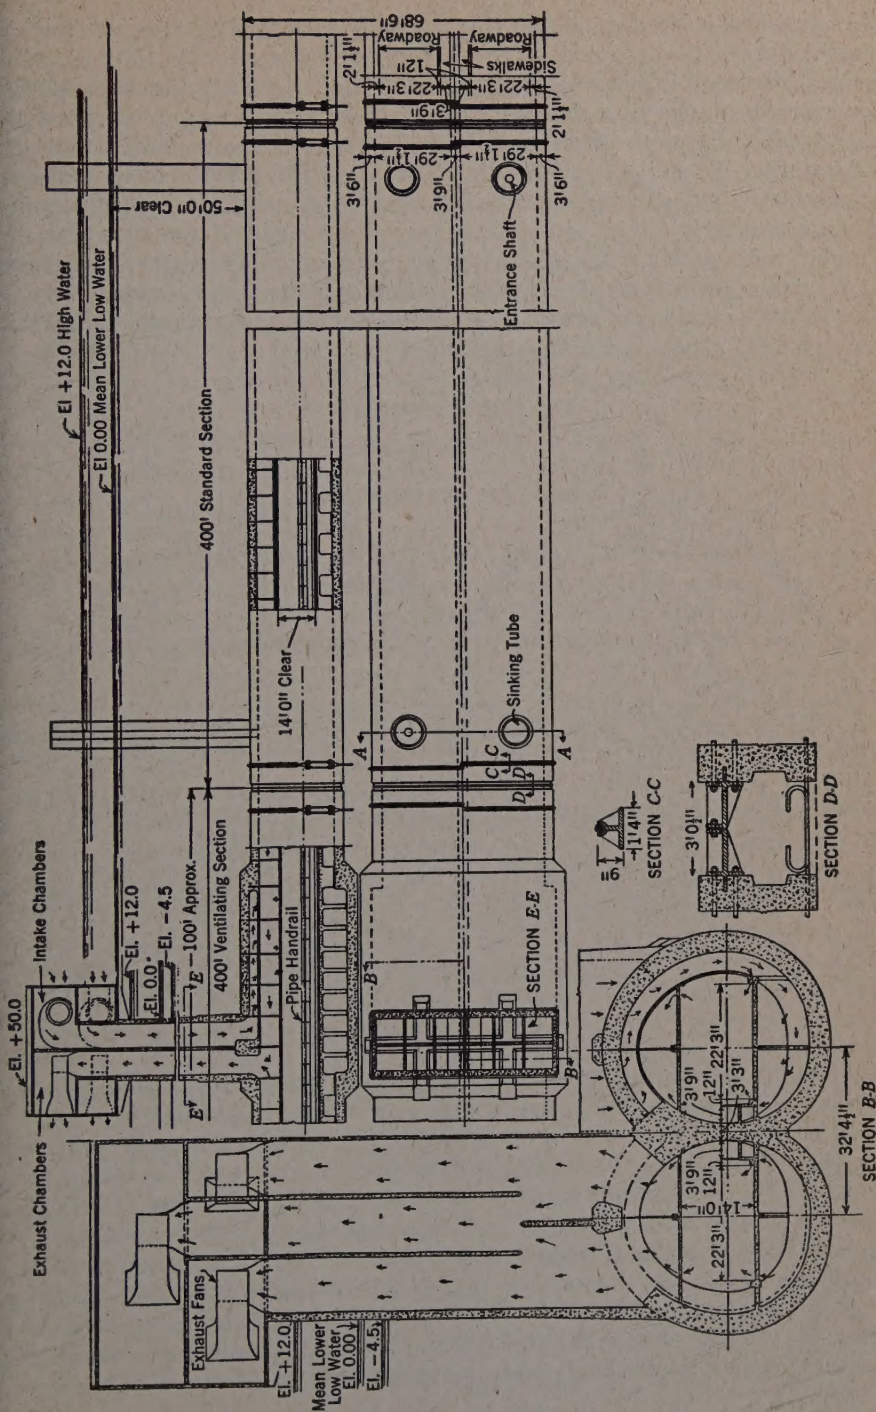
PRELIMINARY PLAN, FLOATING TWIN TUBES
